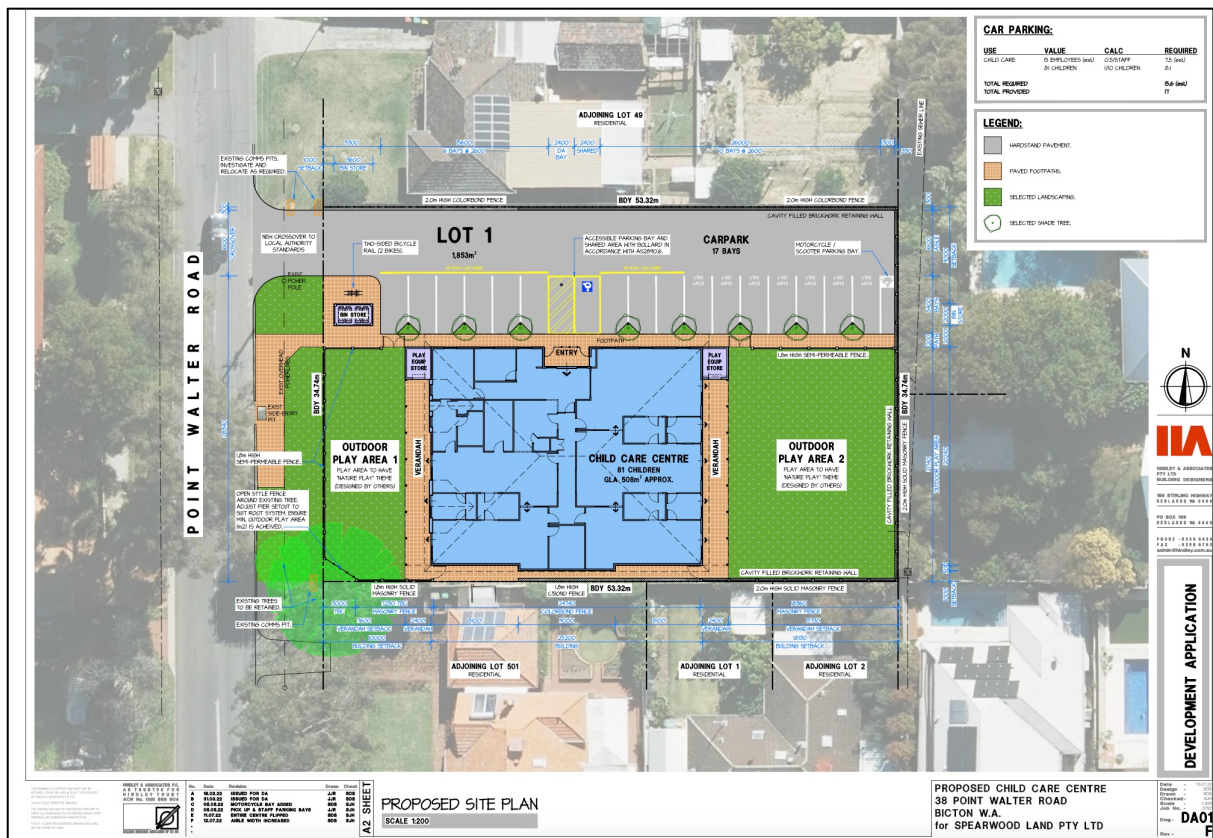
Indicative Site Concept Plan (refer to DA for detail)
